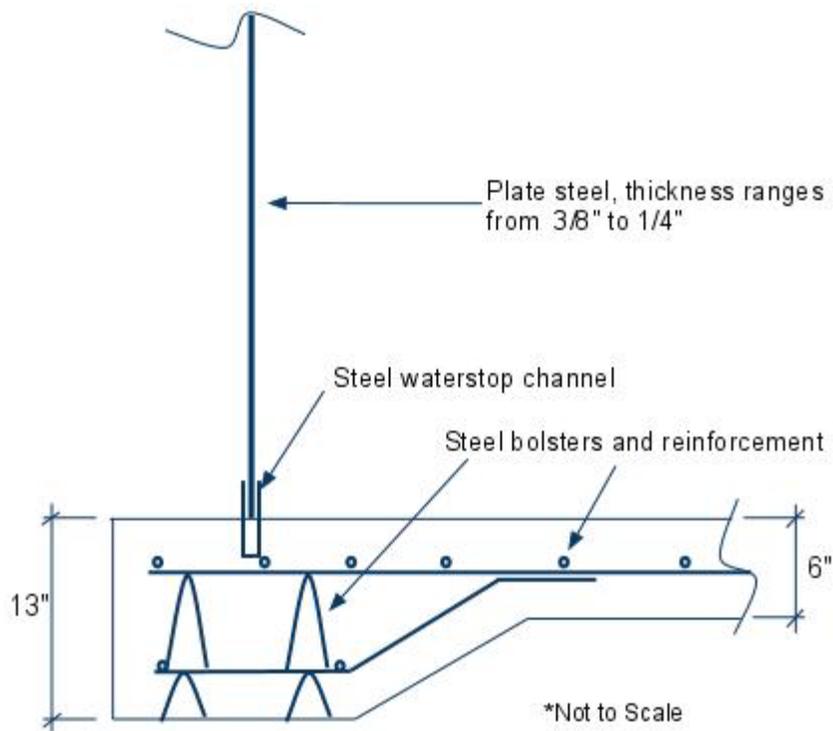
Welded steel water tank section. (Source: adapted from personal communications and engineering drawings as acquired from industry contacts.)
